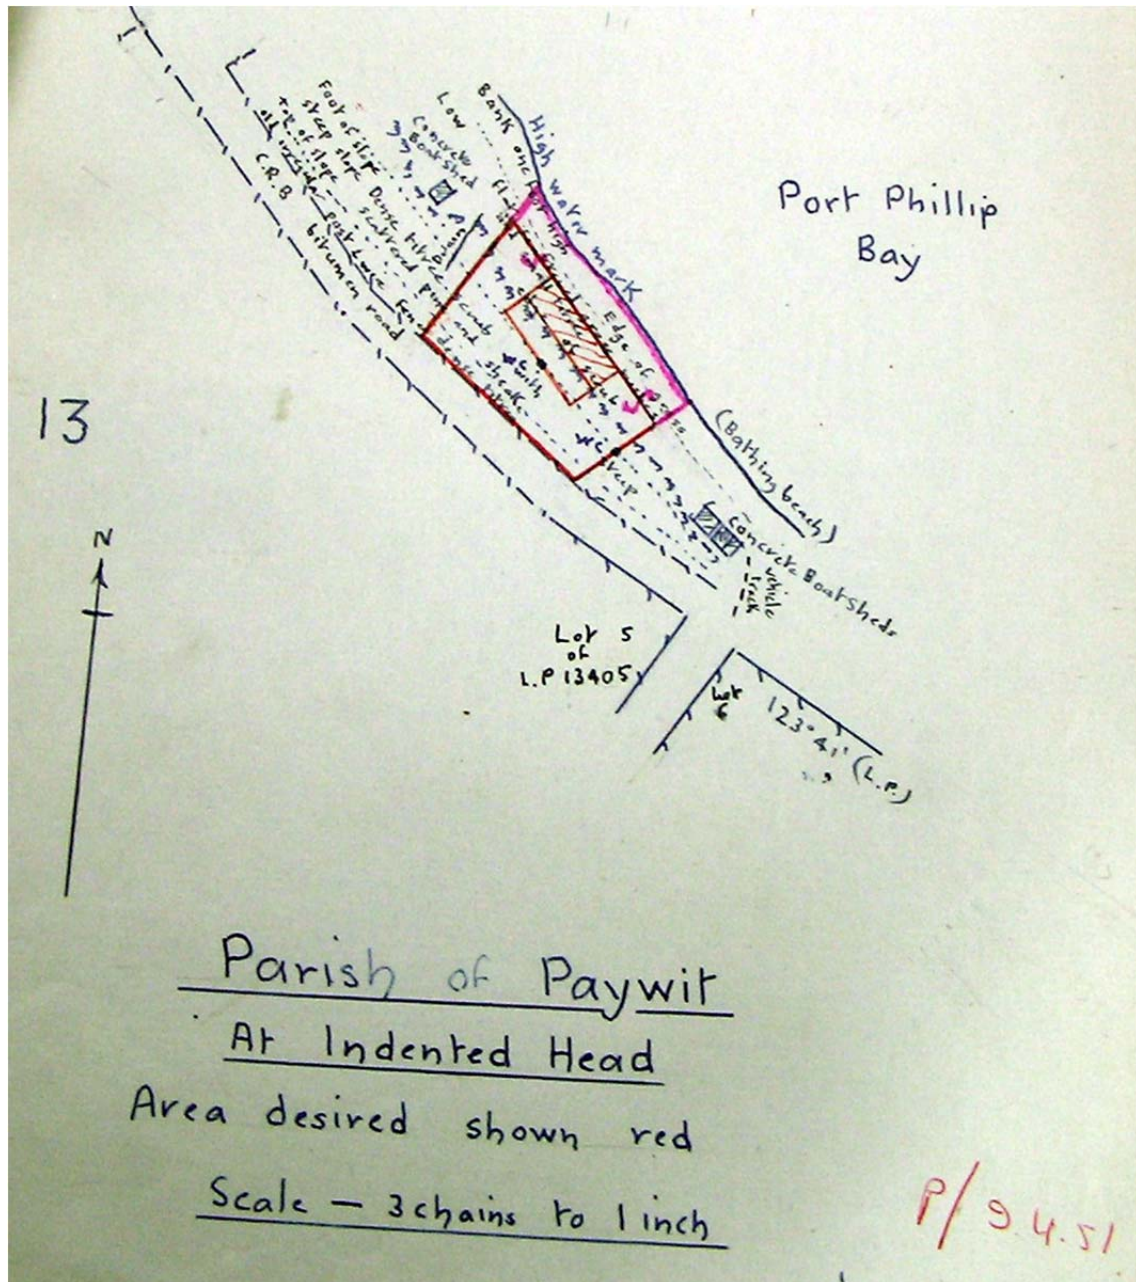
K. Chappel, Site plan showing desired location of proposed Boat Club building, 9 April 1951. Source: Crown Land Reserve file, Rs 5154, Department of Sustainability and Environment, Geelong.
